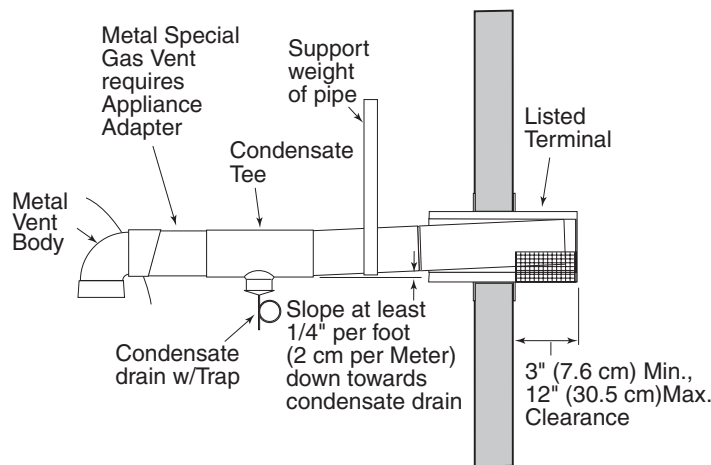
Typical Special Gas Vent Pipe Installation (Horizontal-Positive Pressure)
